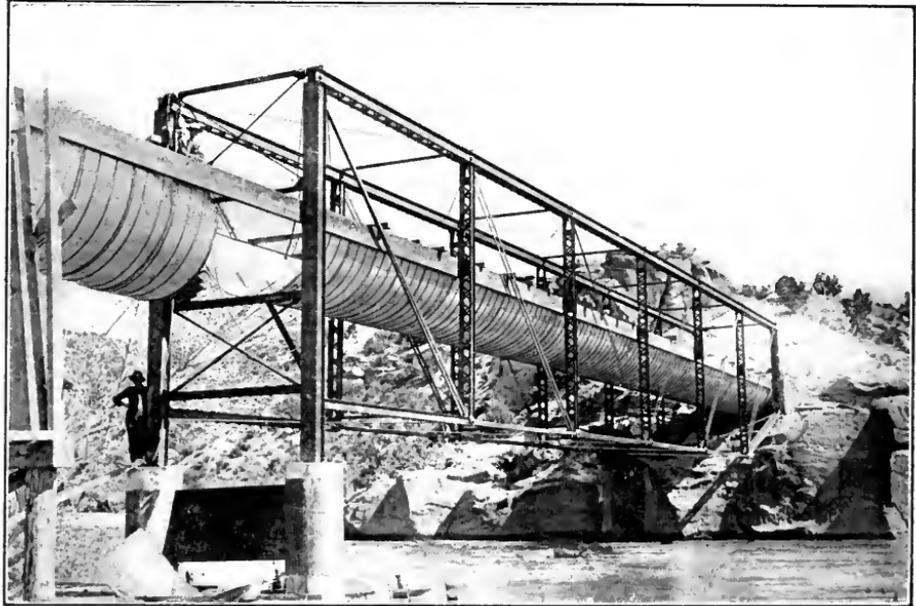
FIG. D.—Lennon steel flume, 9 feet diameter on 110-foot span steel bridge over Las Animas River, Cedar Hill, N. Mex., for Aztec Irrigation Co.
